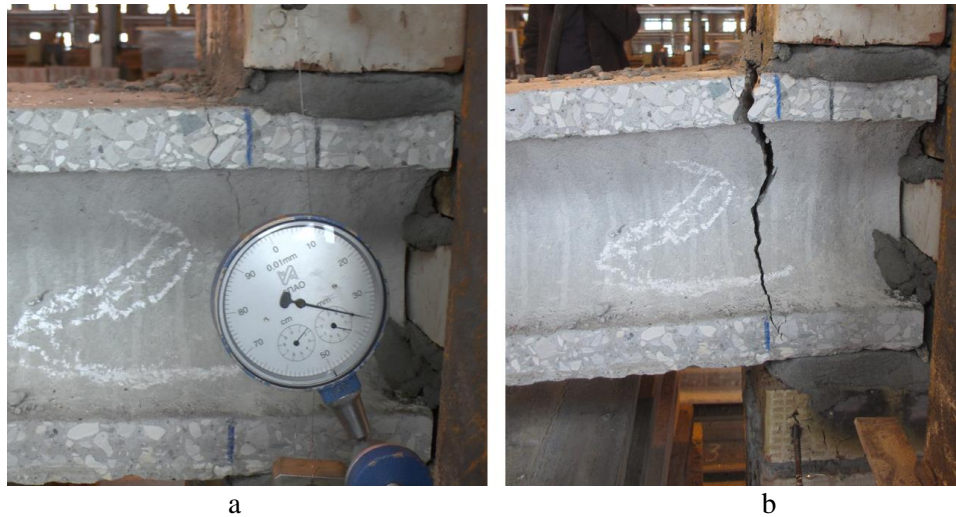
Cracks in the restraint zone of sample №2. a - at load $F=21$ kN (crack opening width up to 0.3 mm); b - at load $F=41$ kN (crack opening up to 9.7 mm)
